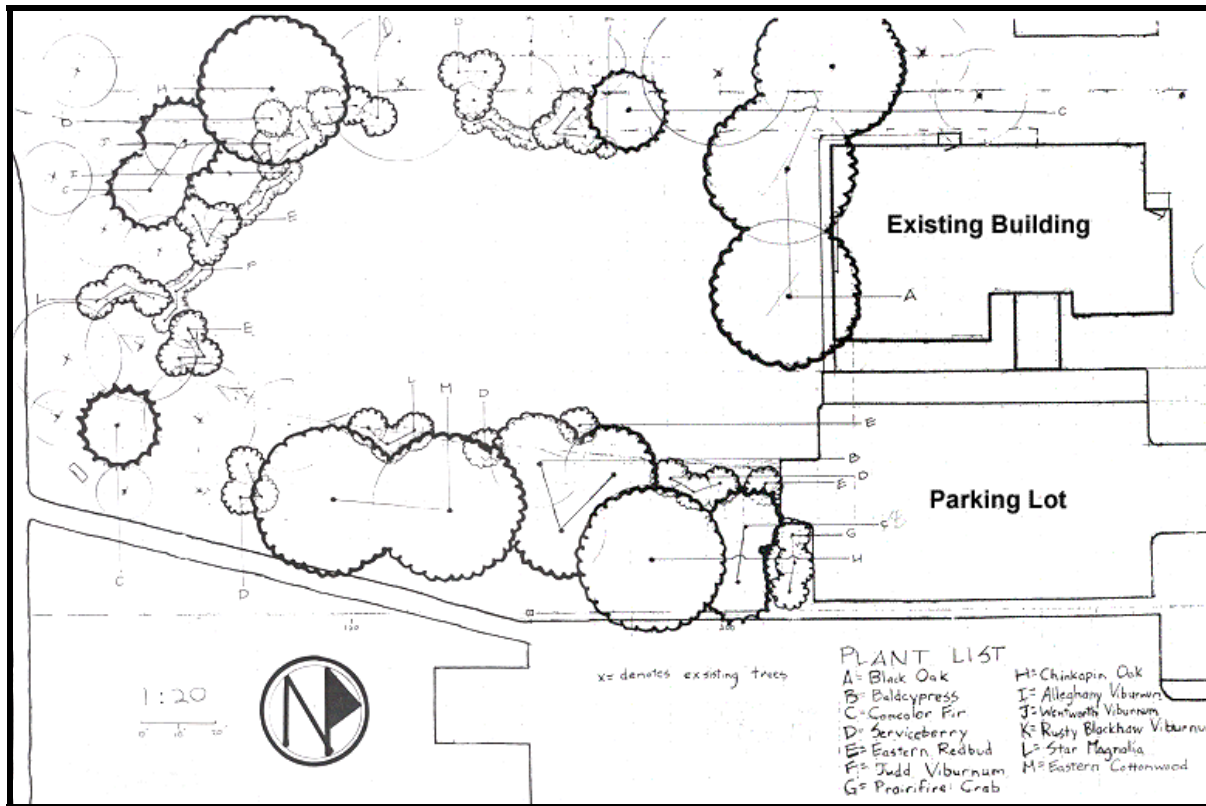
Example planting plan for an urban reforestation site (Source: Omaha Public Power District)
